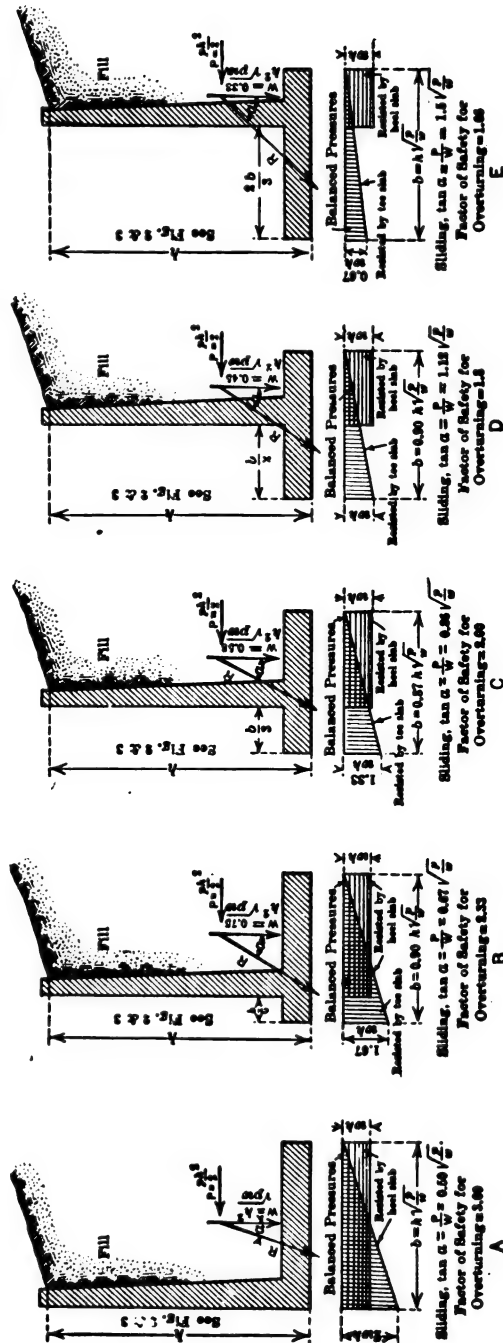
STANDARD TYPE, CANTILEVER WALL.
